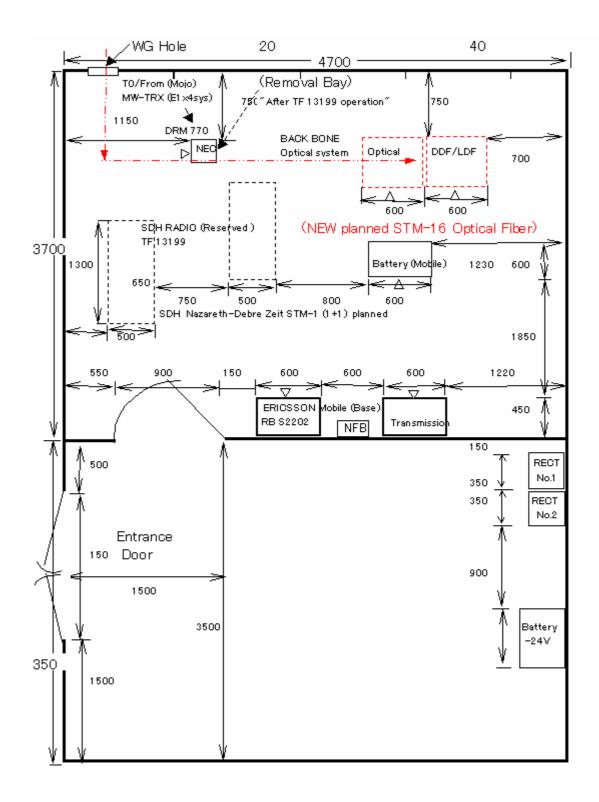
RADIO/MUX / POWER ROOM Planned Installation Place (Debre Zeit)
